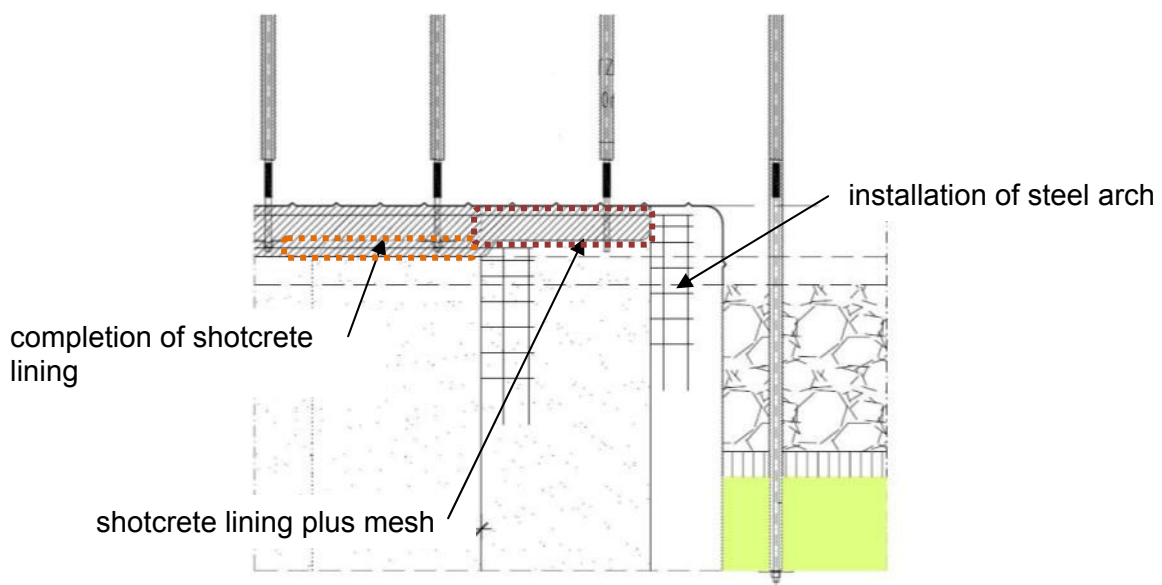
, tunnel enlargement – Phase 3, tunnel cross section (source Beton- und Monierbau)
